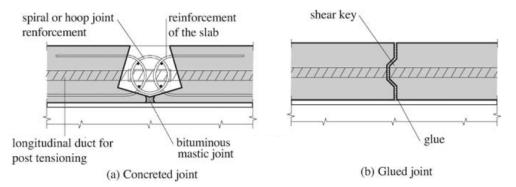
Longitudinal sections of joints in precast slabs (Lebet & Hirt, 2013)
